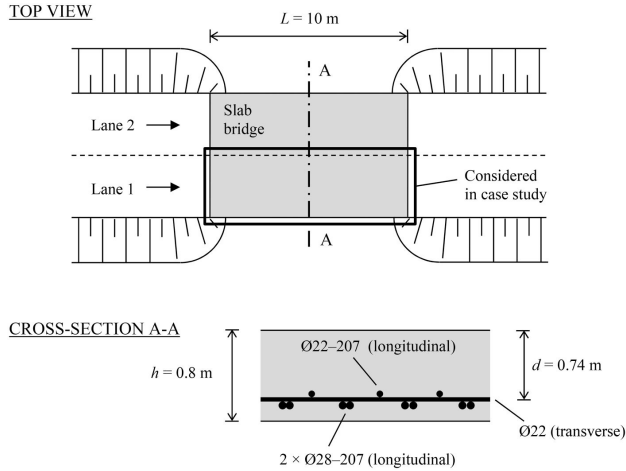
Layout of the reverse-engineered bottom reinforcement of the slab. Rebar size and spacing in mm.
